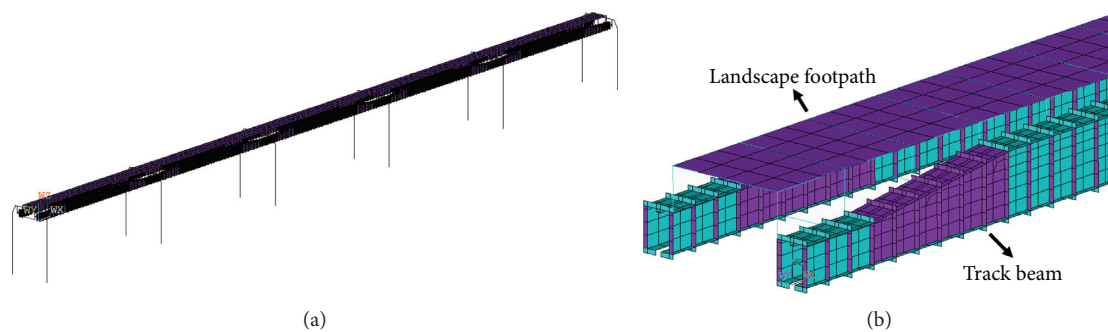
Finite element model of the suspension monorail system. (a) Full-bridge model. (b) Schematic diagram of the partial main beam section.
